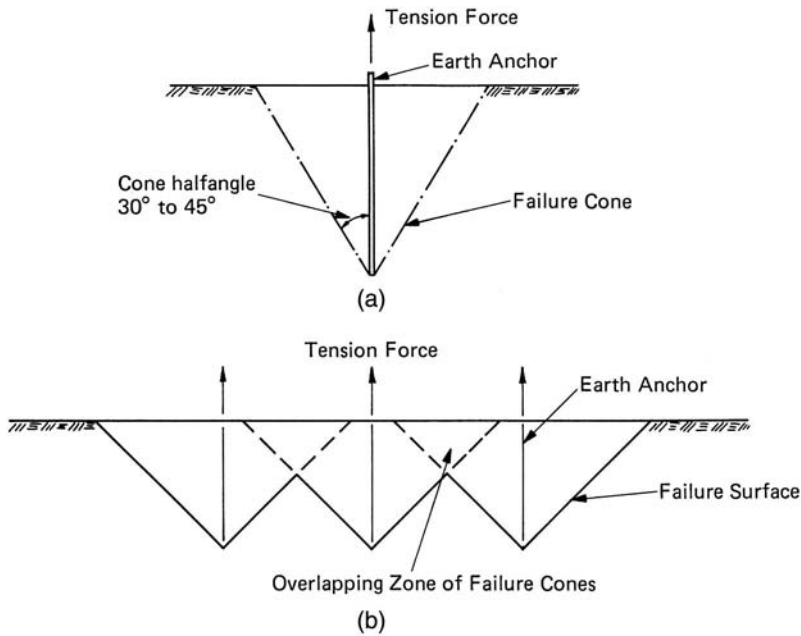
Cone of influence for grouted earth anchors: (a) single anchor; (b) overlapping cones for multiple anchors
